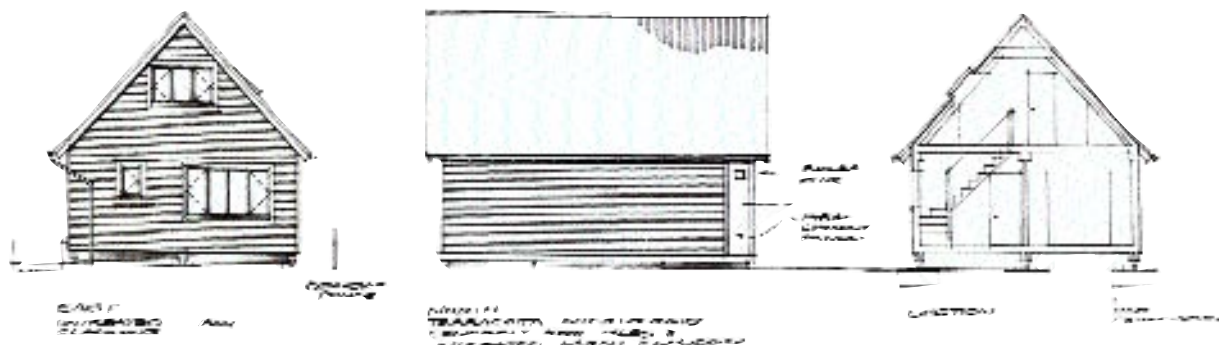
Elevation and section of two storey self-build house showing the economy of “room in the roof” timber construction (drawing
